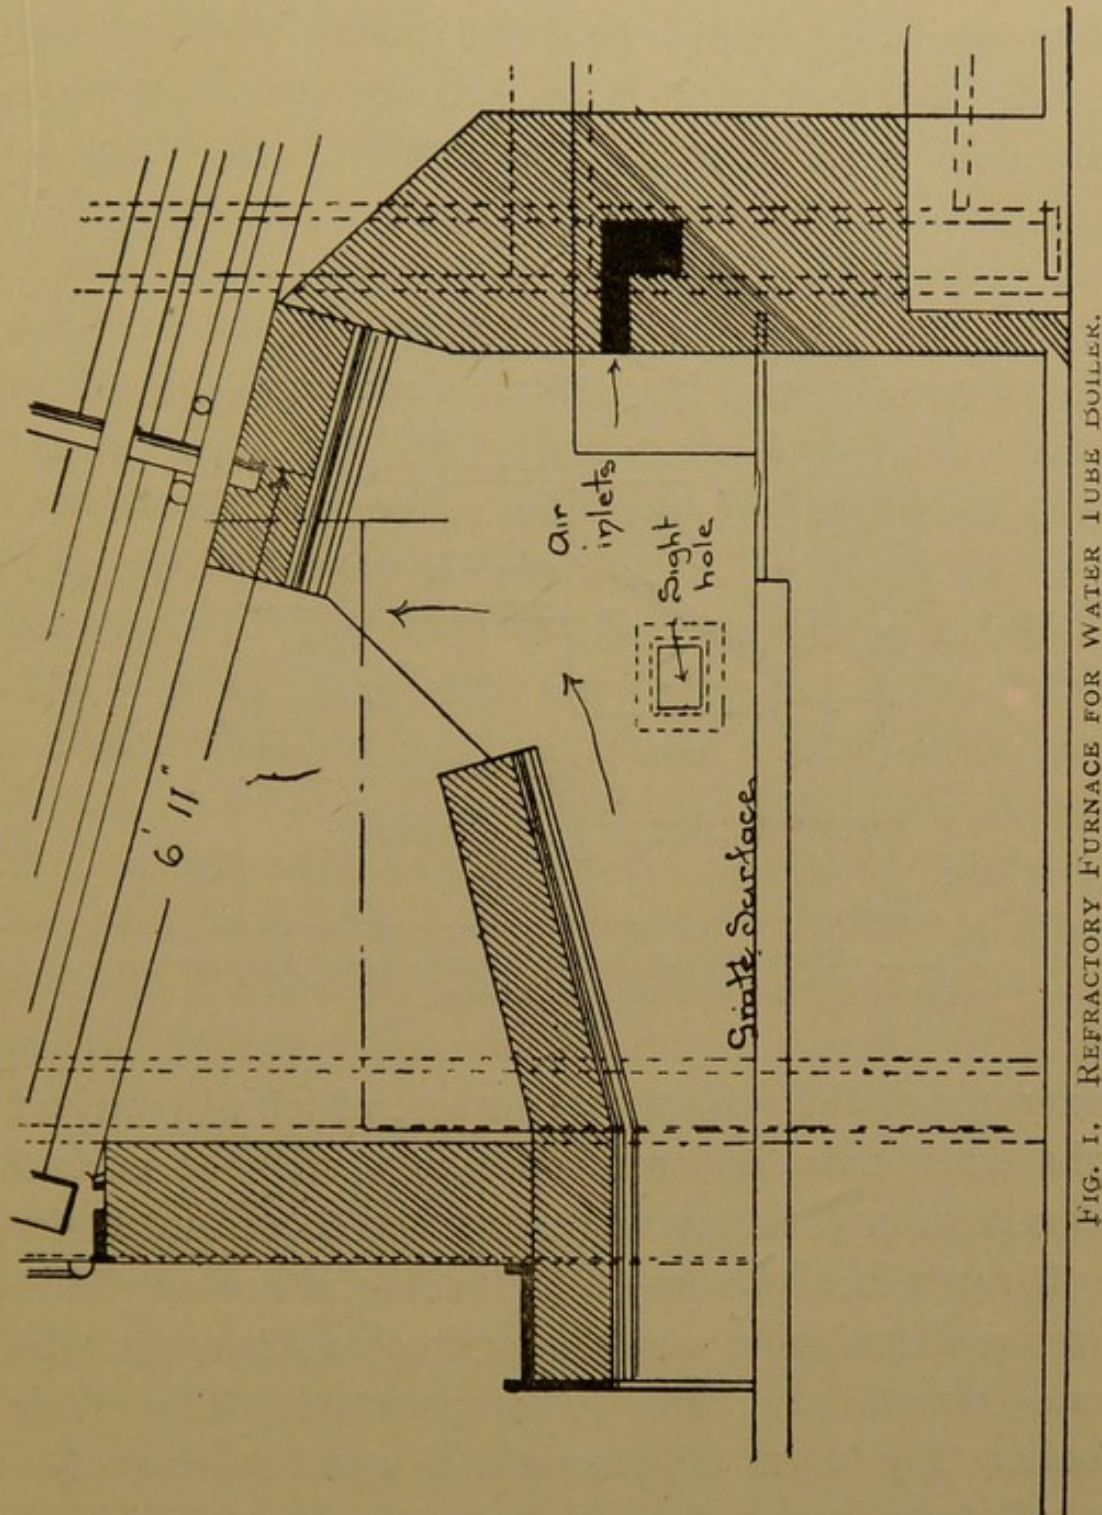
REFRACTORY FURNACE FOR WATER TUBE BOILER.
